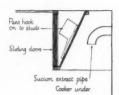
(left). Detail showing service duct and pipes for underfloor heating, Fig. 13 (above). Section showing pan cupboard in hood over cooking space.
